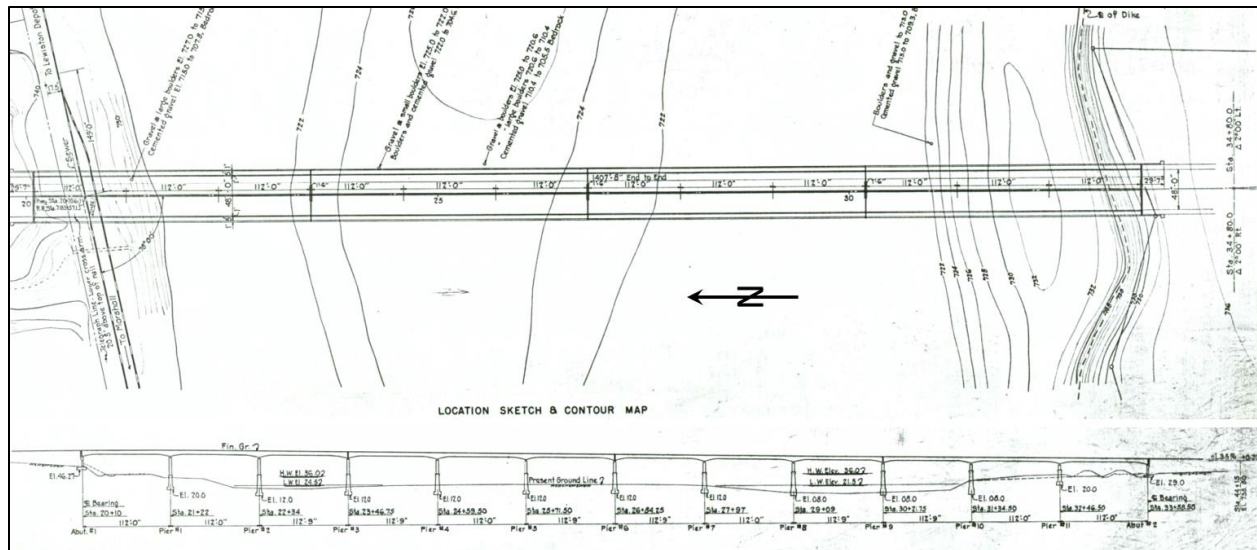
US-12 Memorial Bridge As-Built Plan and Elevation
